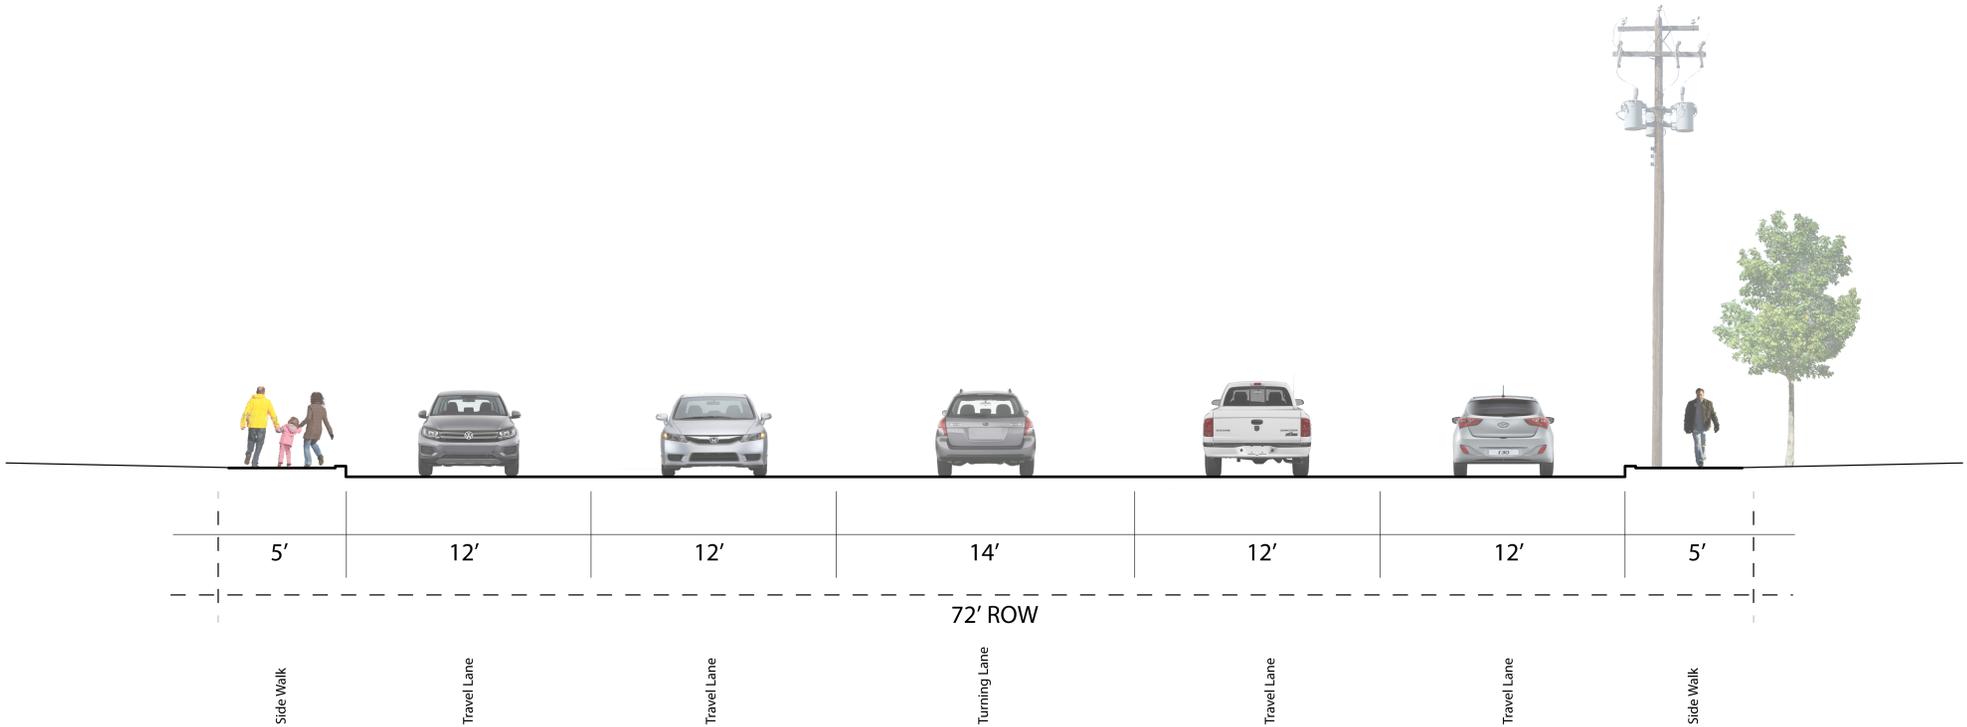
Broadway Cross Section (Restriping Only/Short Term)
